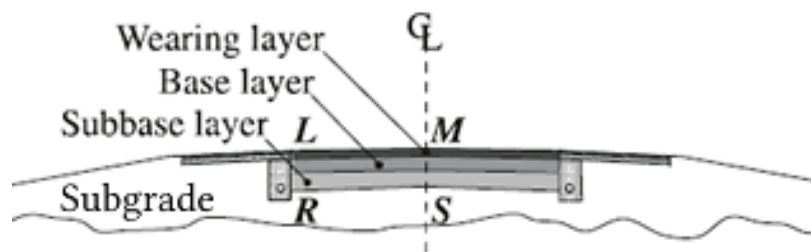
Cross section of pavement, including an edge drain, from Lebeau & Konrad (2009)
